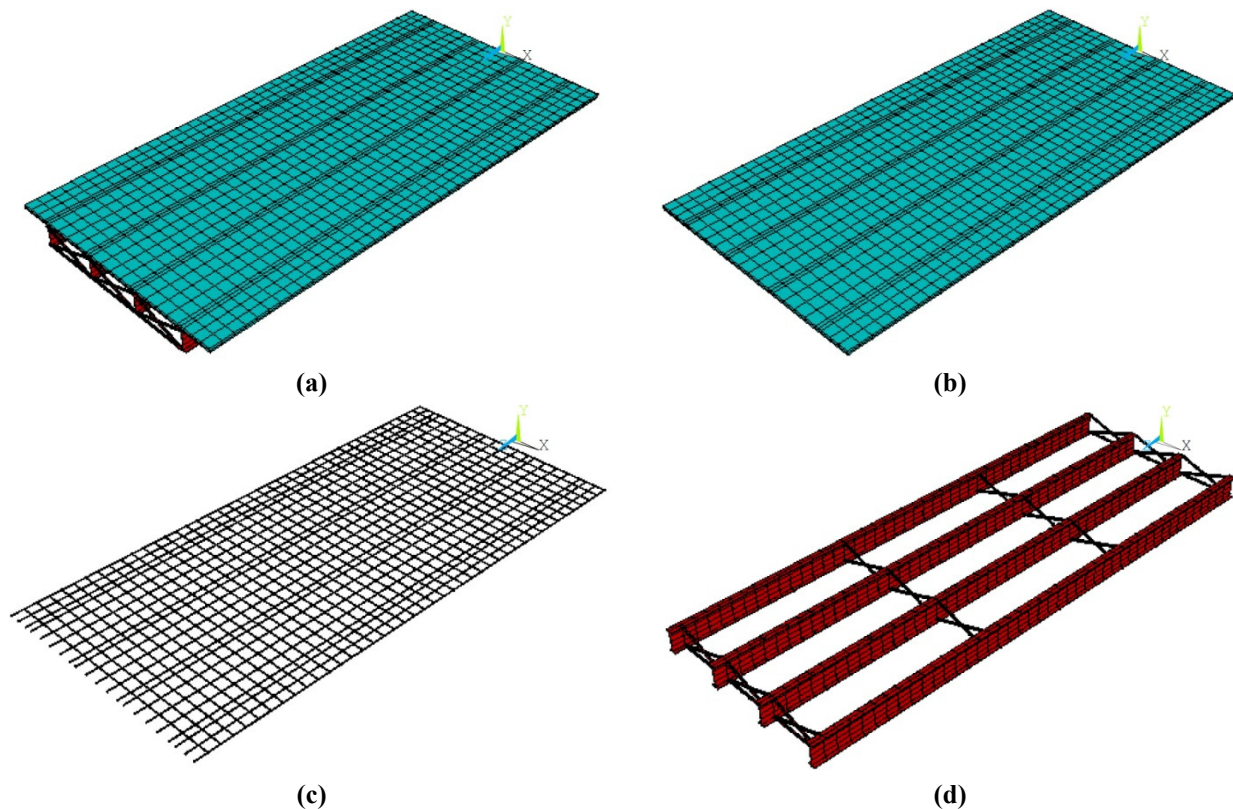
FE model for a 4-span continuous bridge superstructure (only end span of model shown): (a) 3D representation of mesh generation, (b) concrete deck elements, (c) reinforcing rebar elements, (d) Steel girders and cross frame (bracing) elements.
